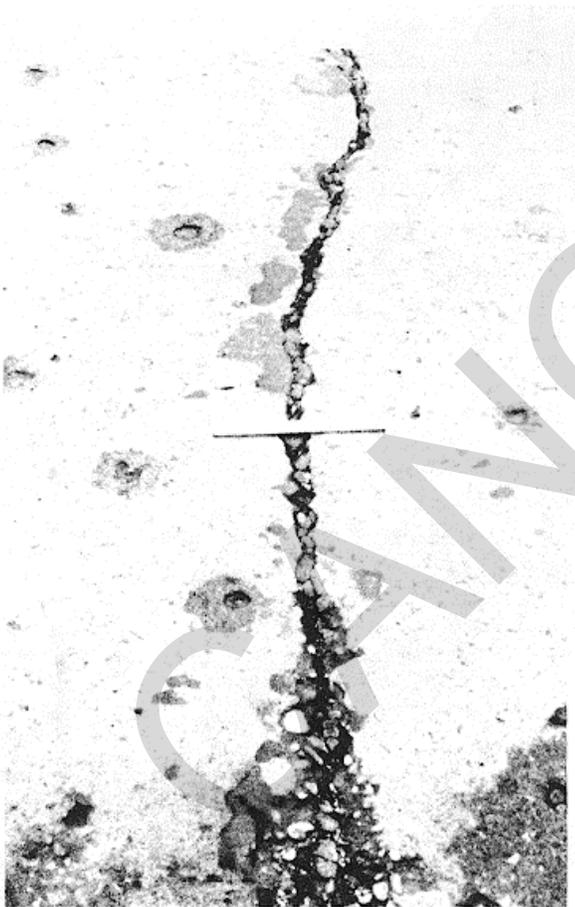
Medium-severity linear cracking in a reinforced concrete slab.
